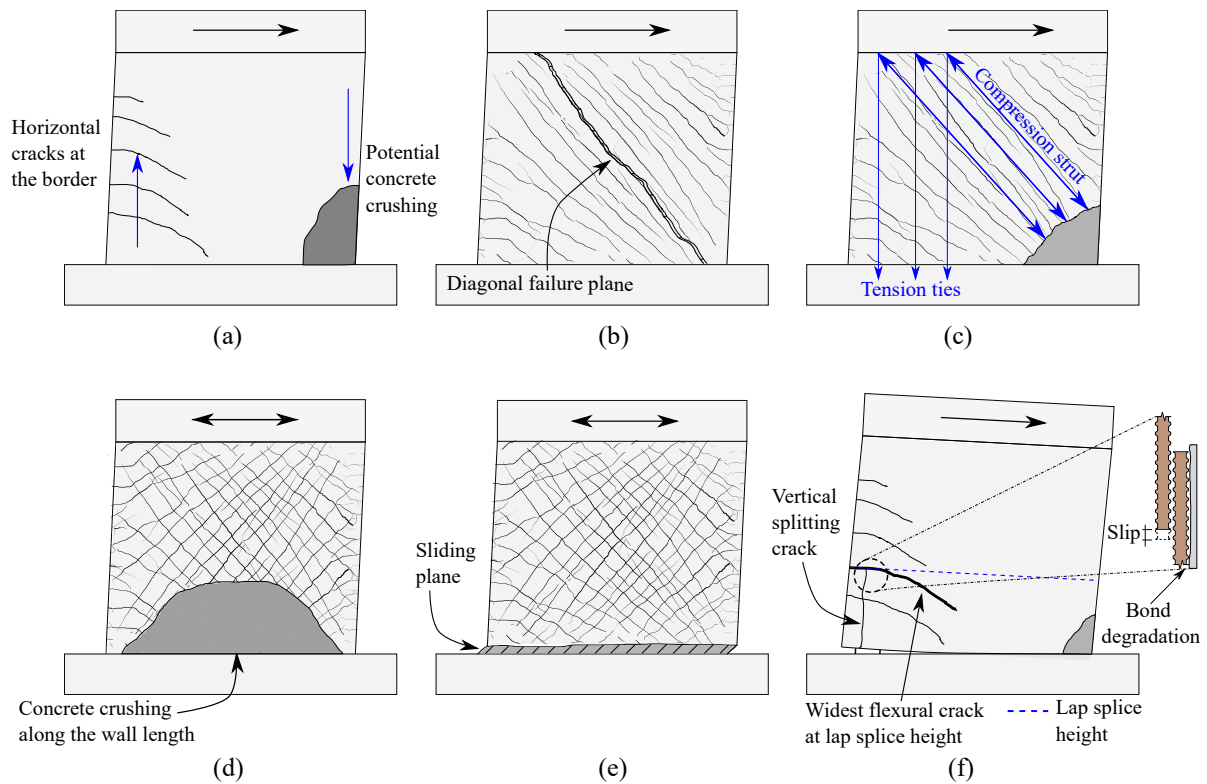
Failure modes in reinforced concrete shear walls (a) Flexure failure mode (b) Shear diagonal tension failure mode (c) Shear diagonal compression failure mode (d) Shear diagonal compression failure mode with concrete crushing across the length of the wall (e) Sliding failure mode (f) Rocking failure mode
